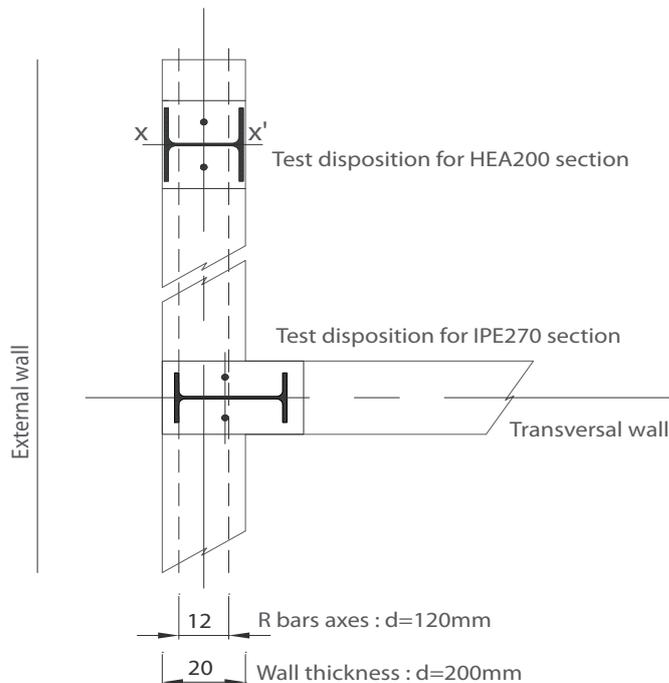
Two possible arrangements for testing pinned laminated section frames joints
